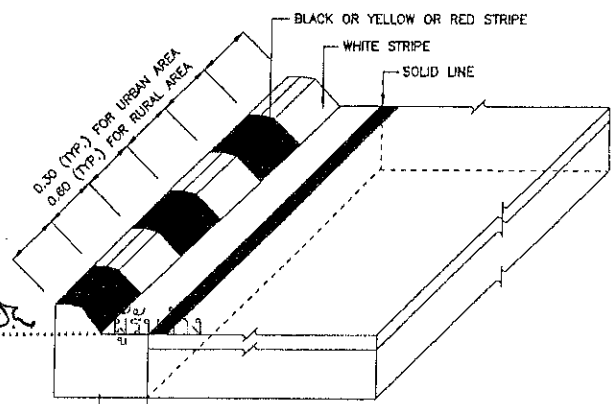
DETAIL OF CURB AND GUTTER OR CURB AT RAISED MEDIAN
